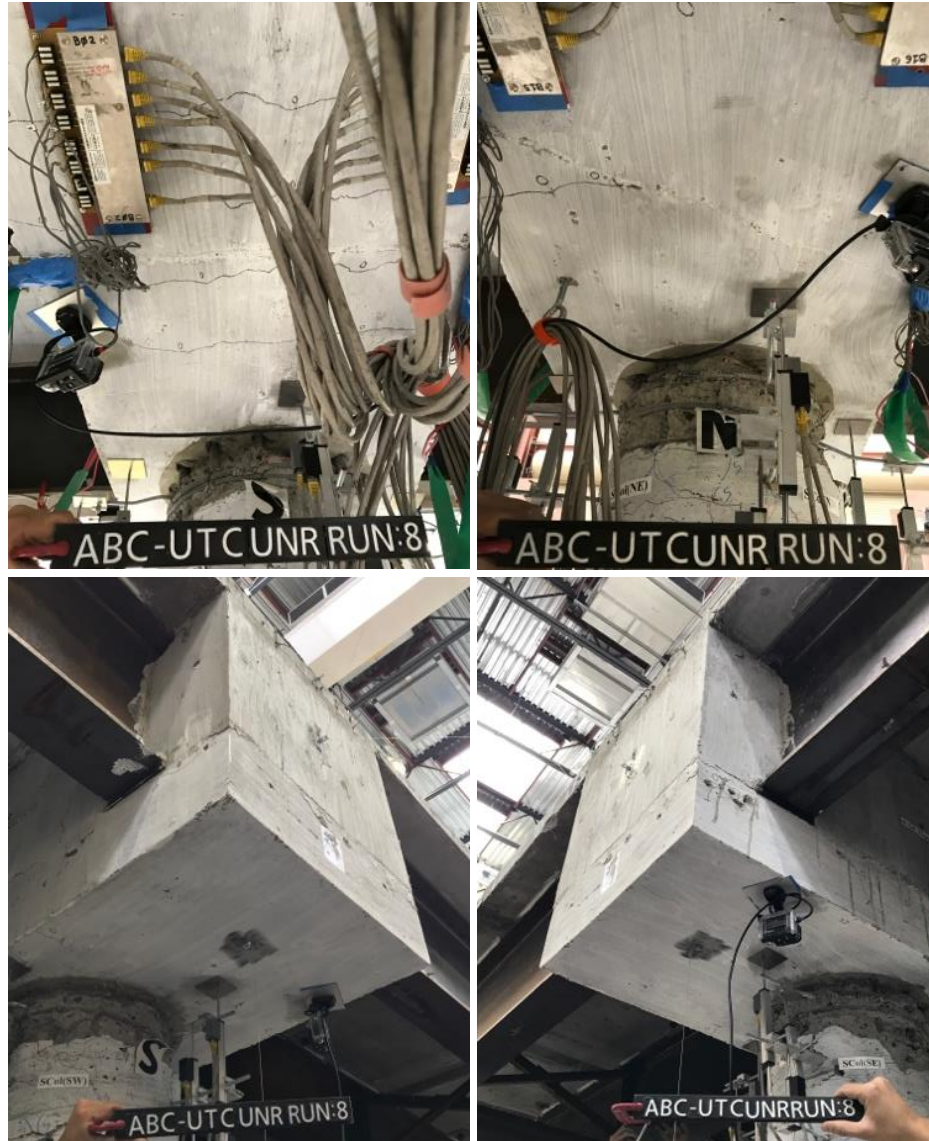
Damage states of the precast cap beam after the last run (Images by Elmira Shoushtari)
